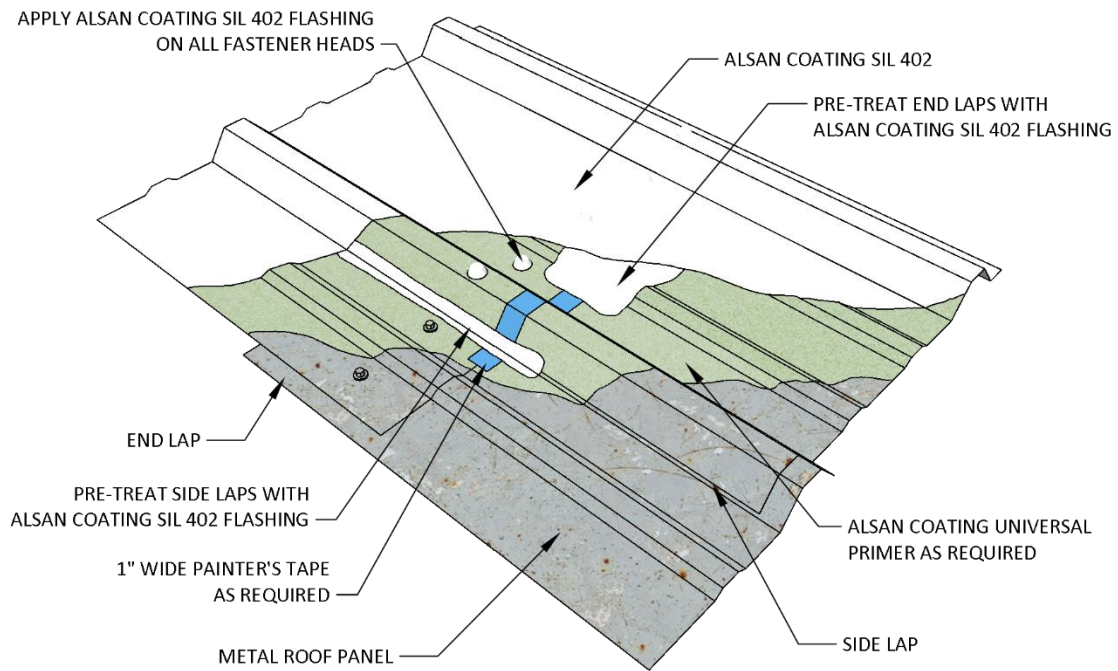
Silicone Roof Coating Over Metal Lap Panels, Side/End Laps
